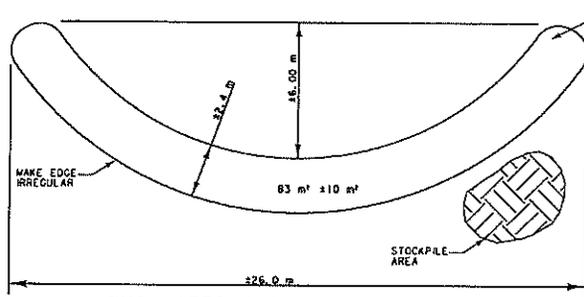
DETAIL B STREAM BANK BIODESIGN DETAIL - SCALE: N.T.S. UNDER MISSION CREEK BRIDGE
